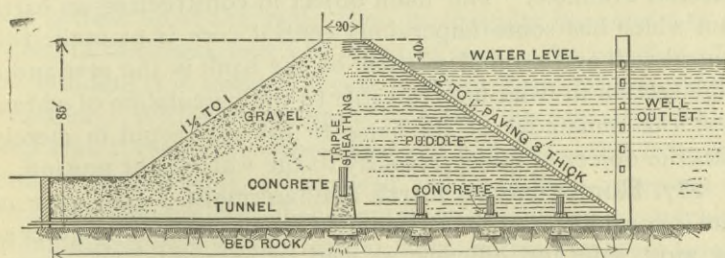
CROSS-SECTION OF EARTH DAM, SANTA FÉ, SHOWING MASONRY CROSS TRENCHES.
